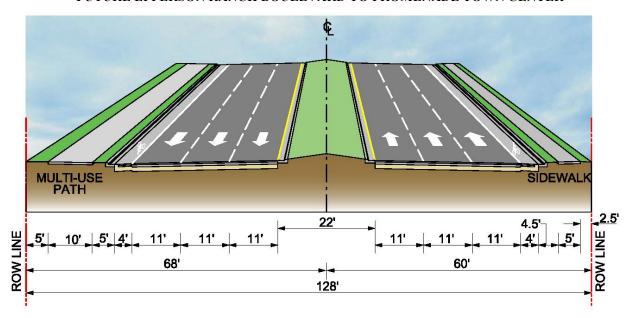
SIX-LANE DIVIDED URBAN TYPICAL SECTION THROUGH PROMENADE TOWN CENTER
